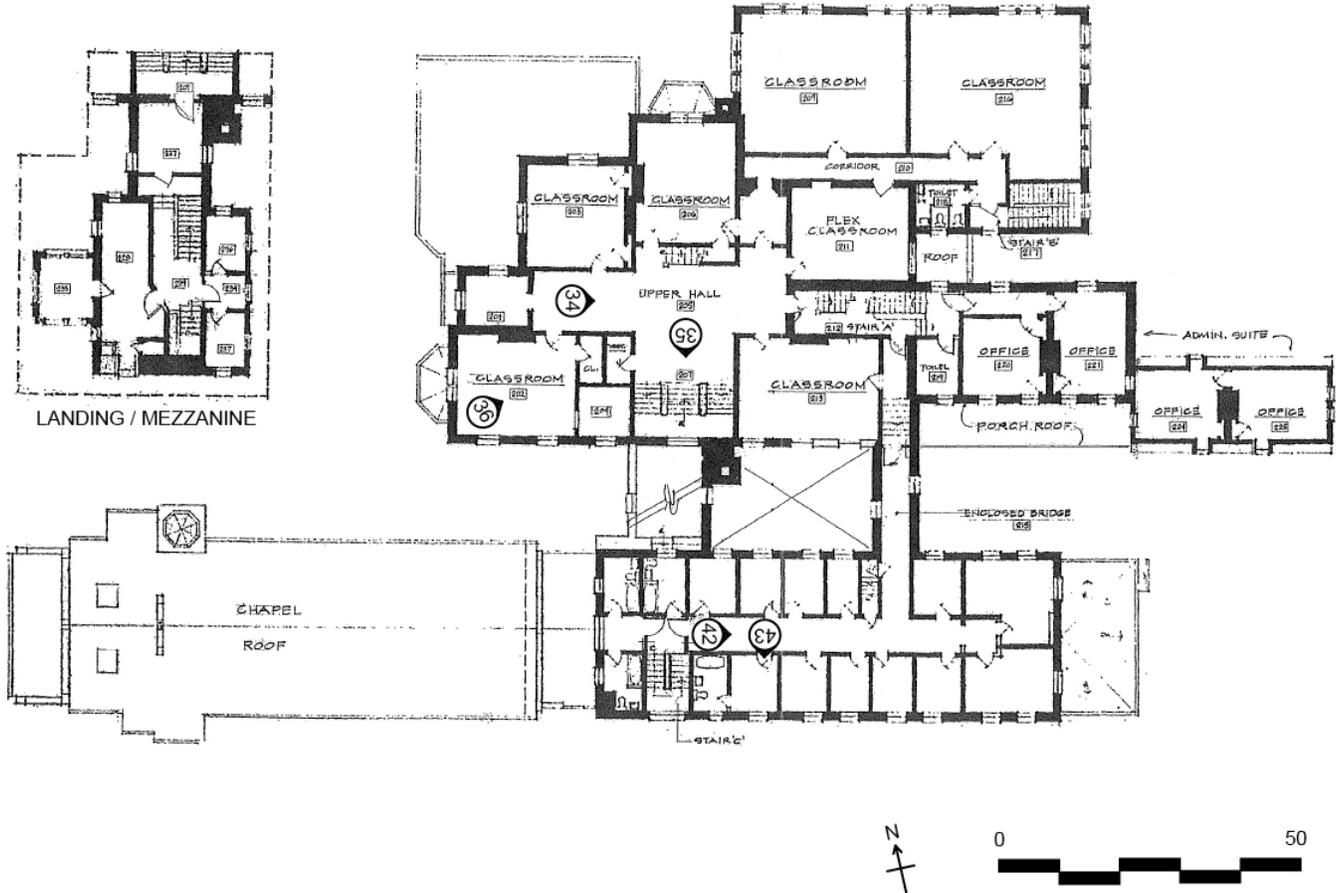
Figure F. Classroom Complex—Existing Conditions—Second Floor Plan—Keyed to Photographs
